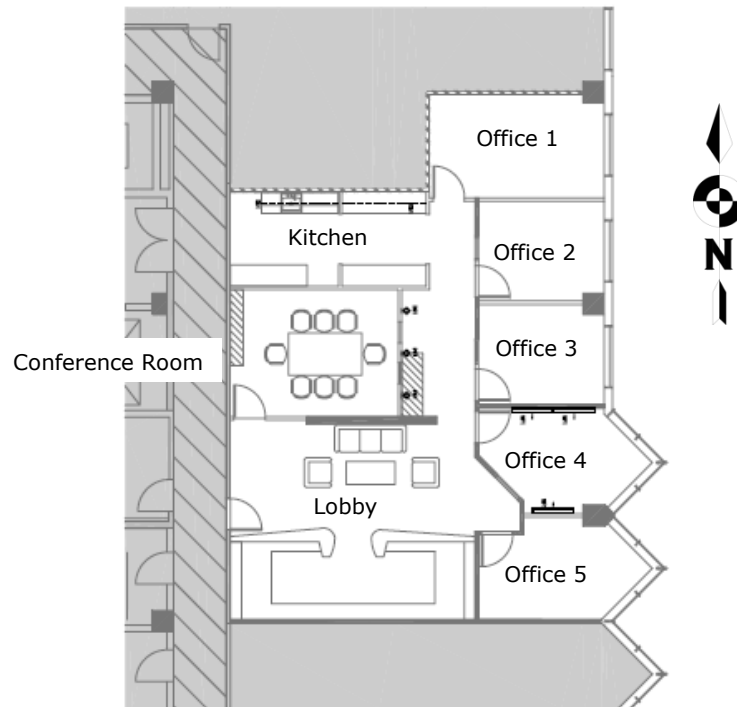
FLOOR PLAN OF THE LANDMARK SQUARE OFFICE SPACE
